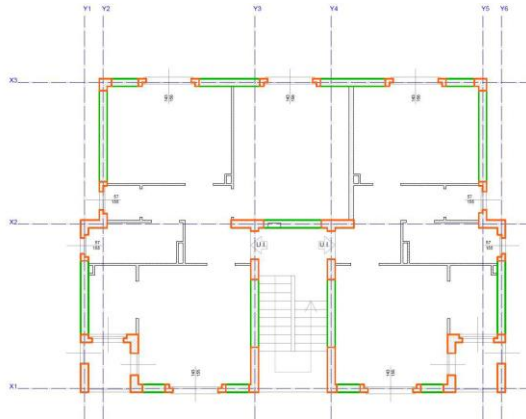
Schematic building plan, in which hollow brickwork is outlined in green and solid brick in orange. From [248].
